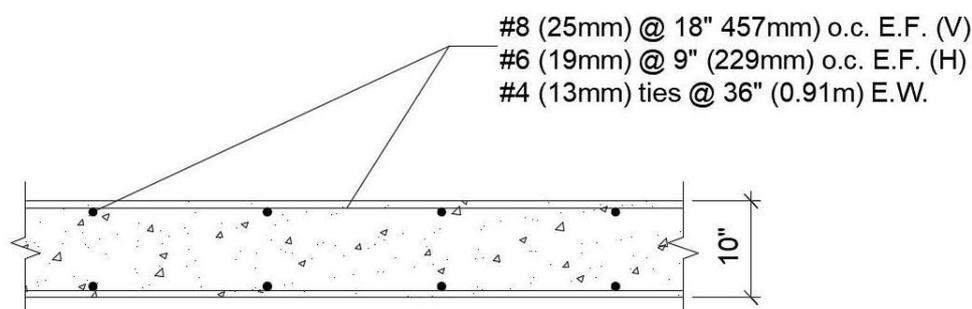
Original reinforcement in shear wall at ground floor (1" = 25.4mm)
